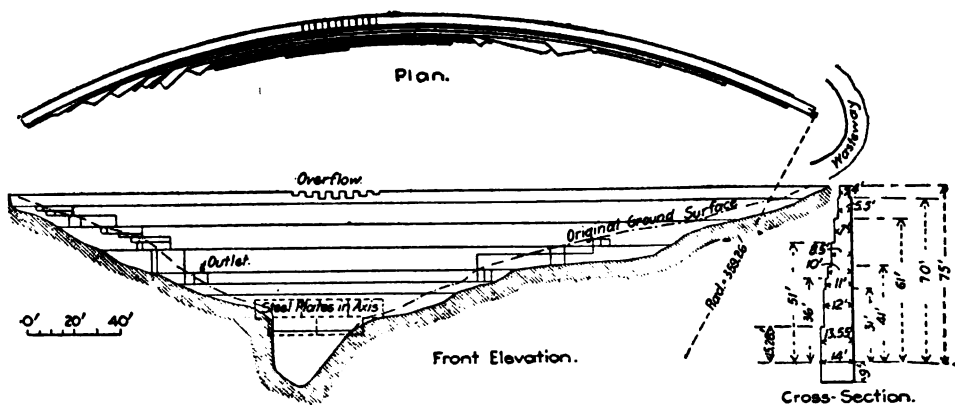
UPPER OTAY DAM, CALIFORNIA. PLAN, SECTION, AND ELEVATION.
